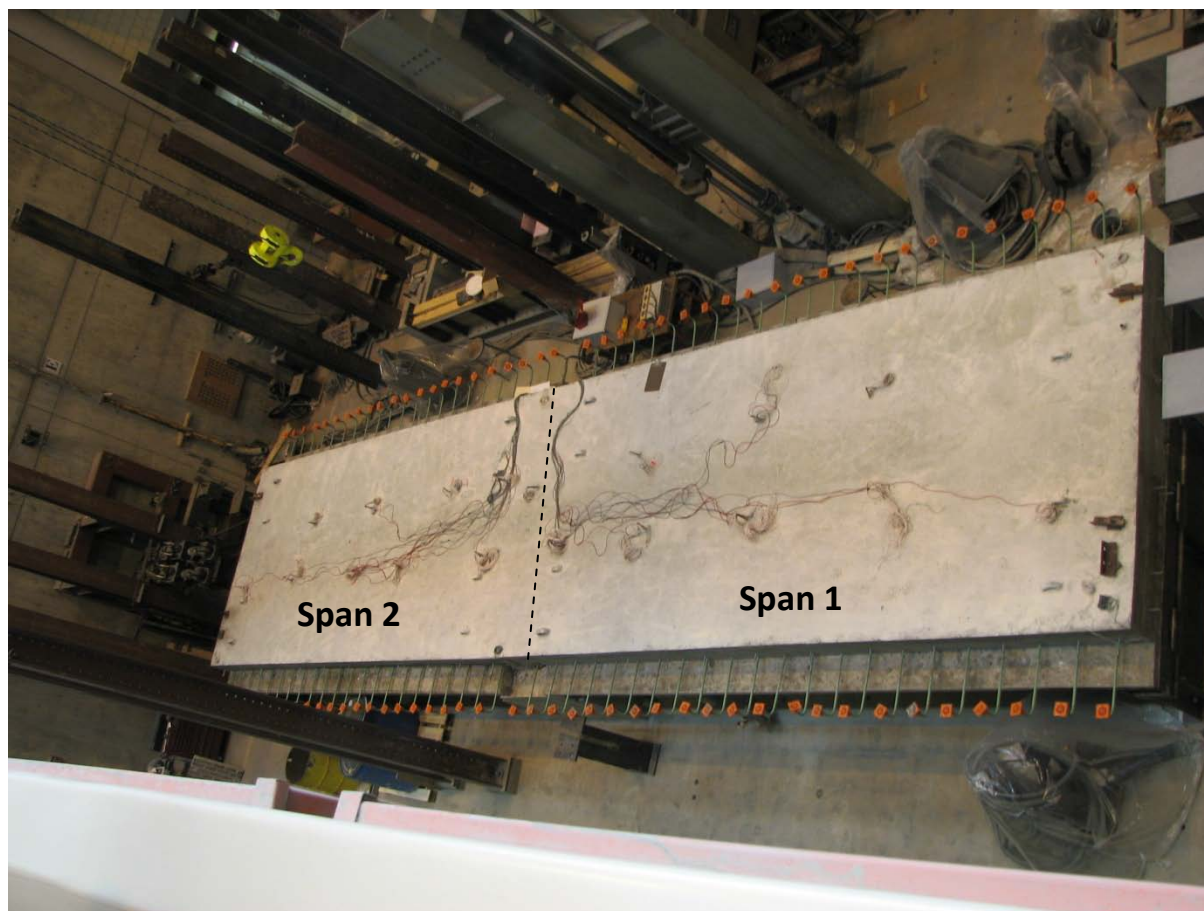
Photograph of the Concept 1 laboratory bridge shortly after completion of the continuity pour
